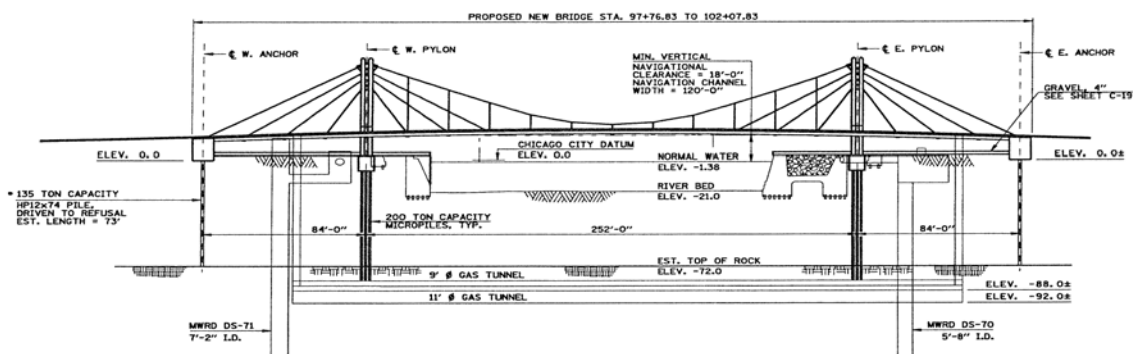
Bridge Elevation View, *Courtesy of McHugh Construction / Bridge Concepts*³
